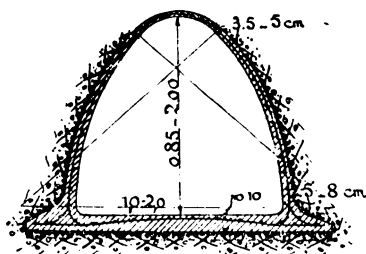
German Sewer Sections, of Reinforced Concrete Construction.
